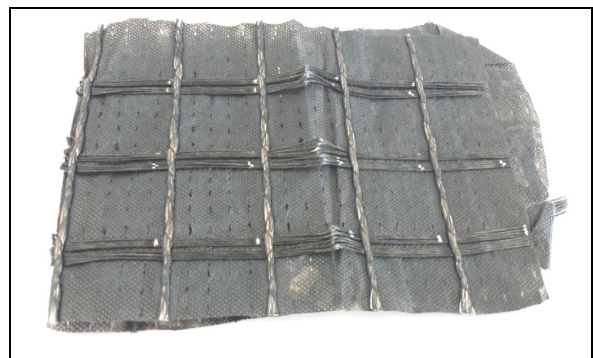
Special type of Geogrid used to reinforce asphalt concrete specimens.
